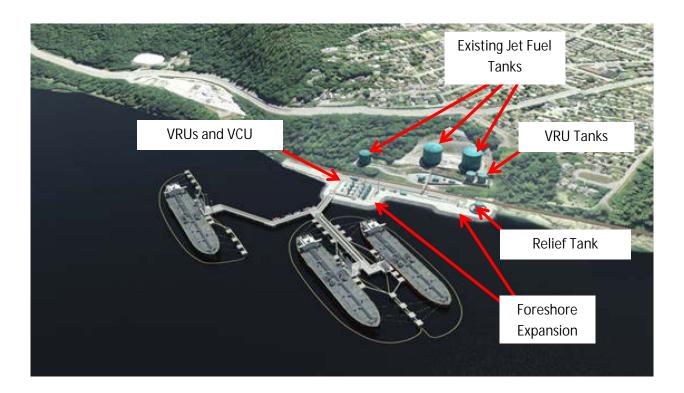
Westridge Marine Terminal Construction Scope Elements
